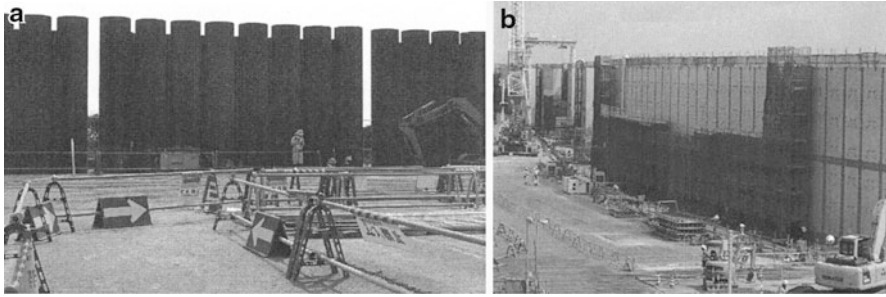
Tsunami barrier wall of Hamaoka nuclear power plant. (a) Steel pipe wall. (b) Steel box wall
